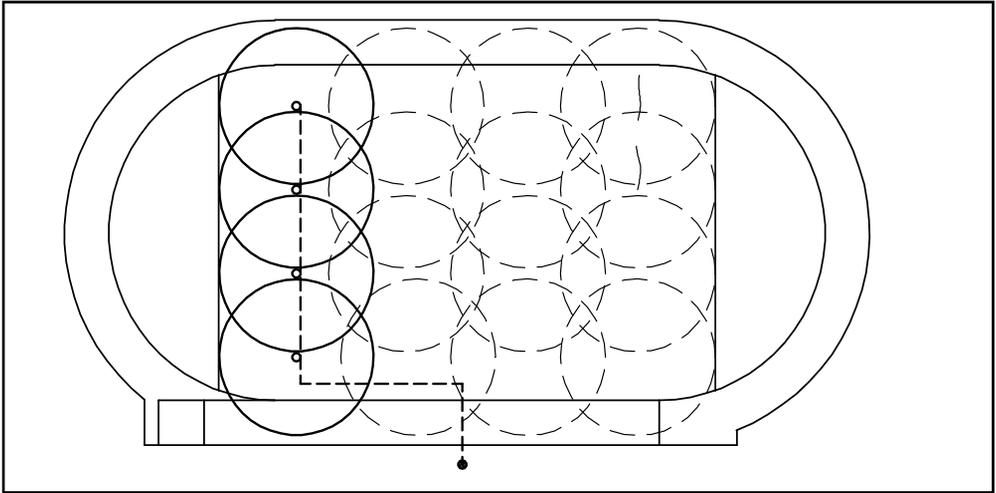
Sprinklers on temporarily laid pressure pipes
